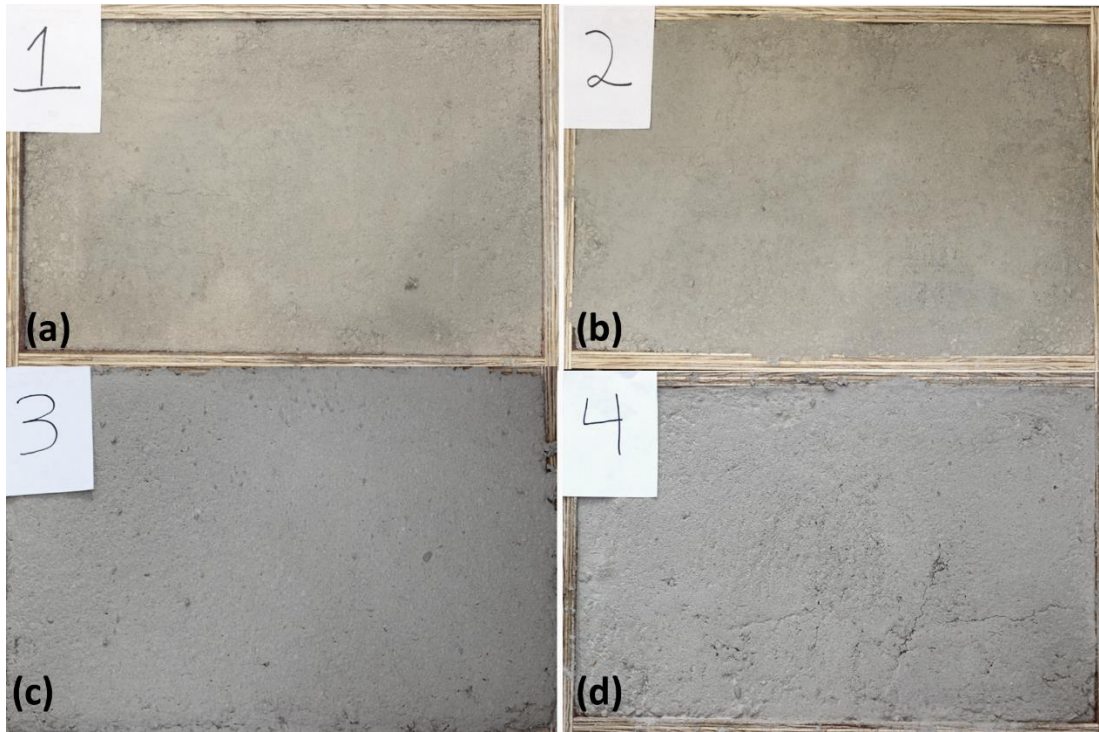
Photograph of plastic shrinkage of LMC-VES concrete specimens without retarding agent or fiber reinforcement after 24 hours; (a,b) results from the first test, specimens 1 and 2; and (b,c) results from the second test.
